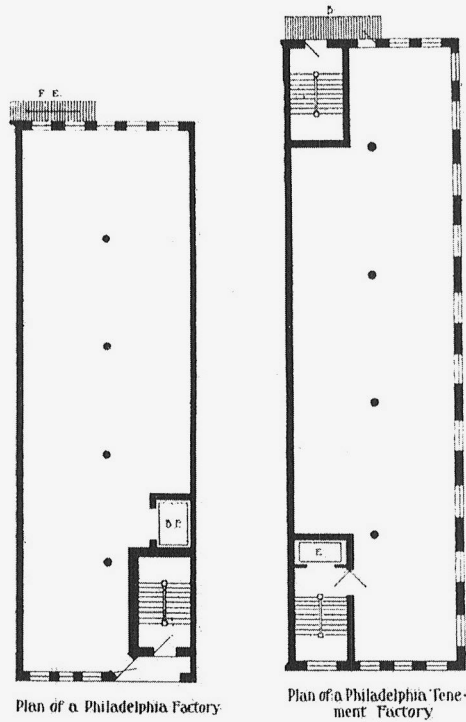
Floor plans of Philadelphia smoke-proof-tower fire escapes. Left, a tower accessed via a vestibule. Right, smoke-proof tower at the rear of a factory, accessed via a projecting balcony. (Charles Daubney, "Fire-Escapes in American Commercial Buildings," *American Architect*, 31 January 1903, 38.)
